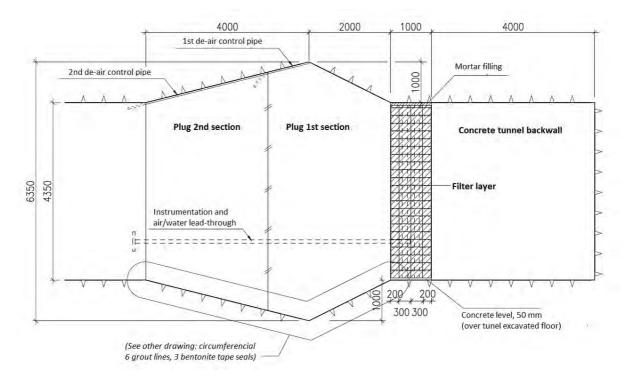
Posiva's design for the POPLU (Wedge Plug) experiment, with filter layer shown at right.
